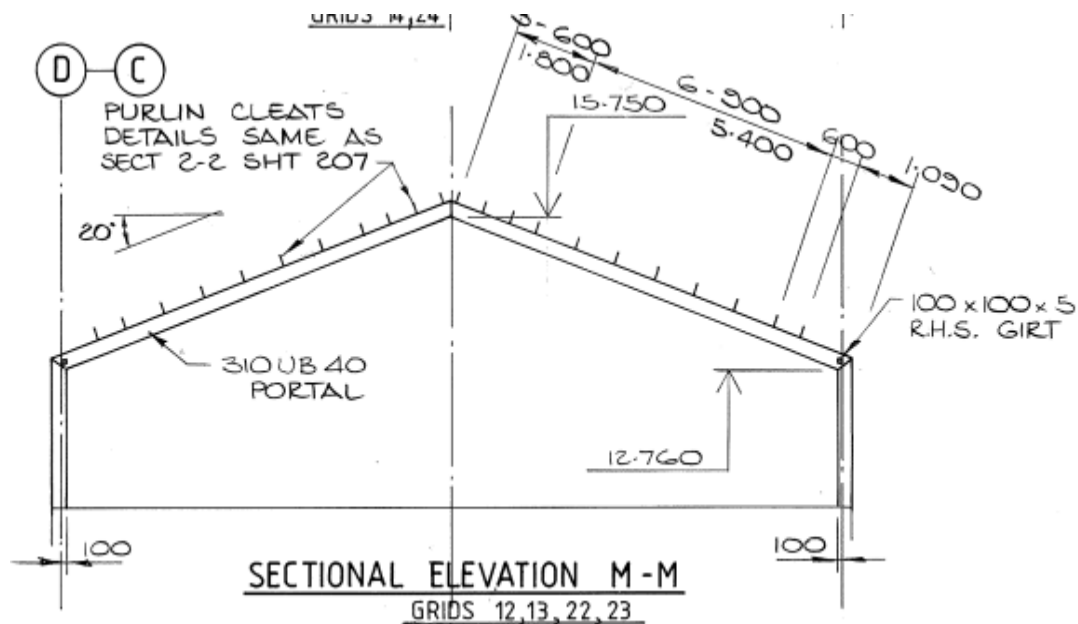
Typical Steel Portal Frame Elevation Extension Wings (Grid Line 2-3 & 12-13)
